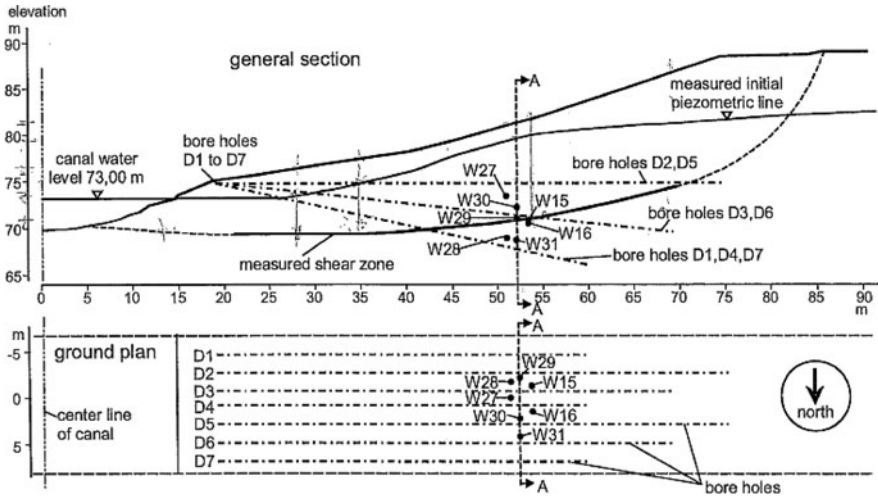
Creeping slope with stiff fissured clay (Schulze and Köhler 2003): cross section and ground plan with boreholes for drainage
